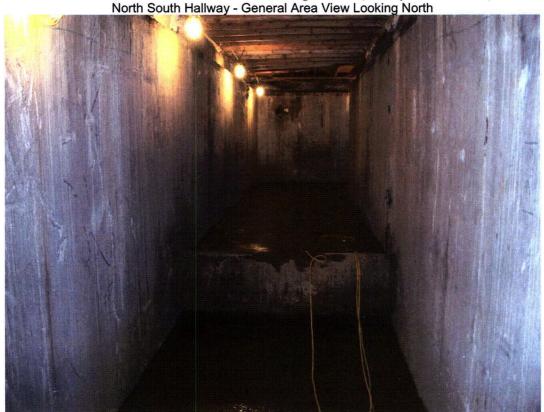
, Views of SEB CPT Connecting Tunnel (Survey Unit SE-3-30)
